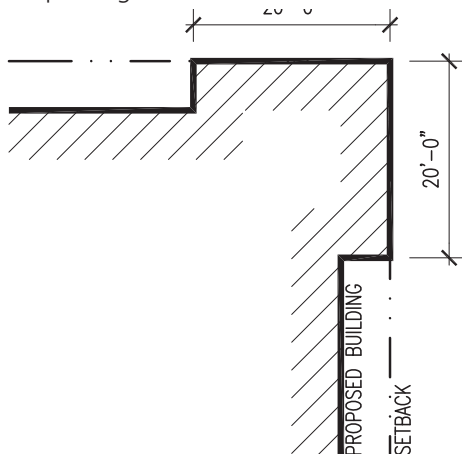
BUILDING EDGE REQUIREMENT AT GATEWAY CORNERS.
